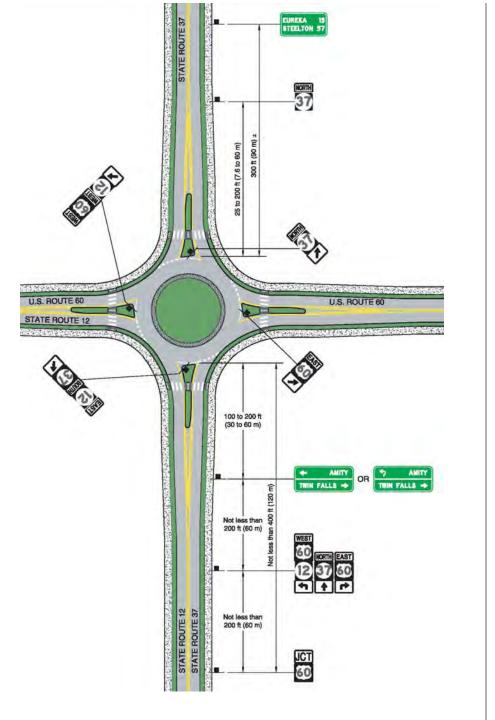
Example Sign Layout for Guide Signs at Roundabouts
